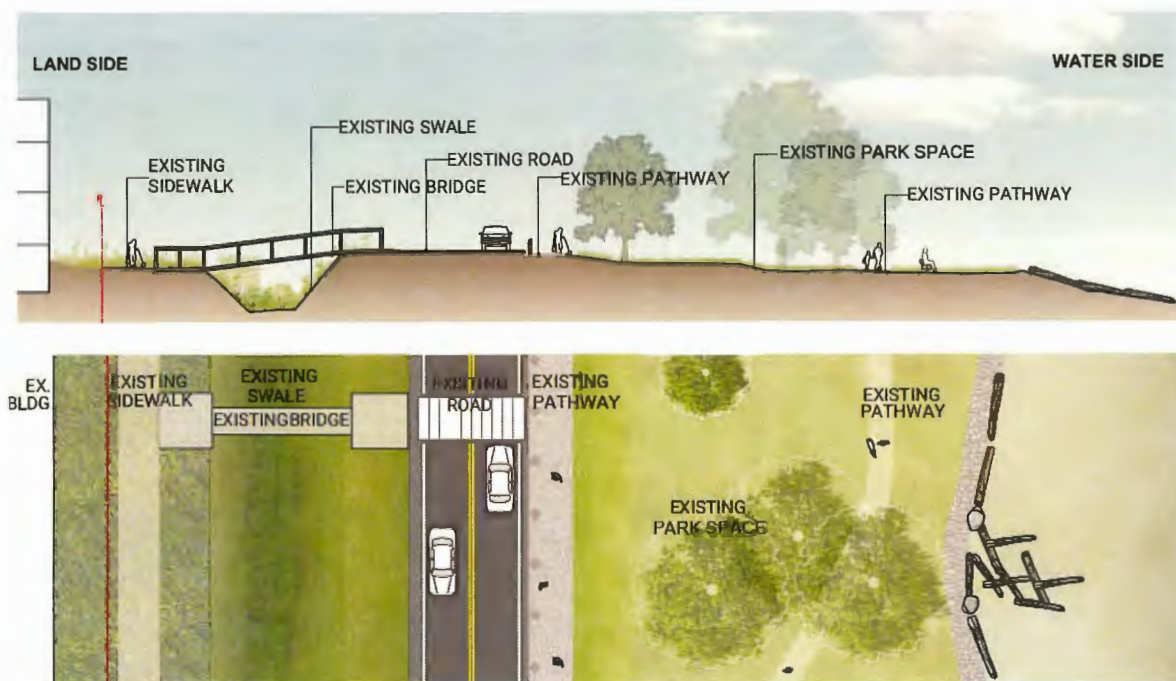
Existing Conditions – Section and Plan View Between 6080 Dyke Road and Gilbert Road
